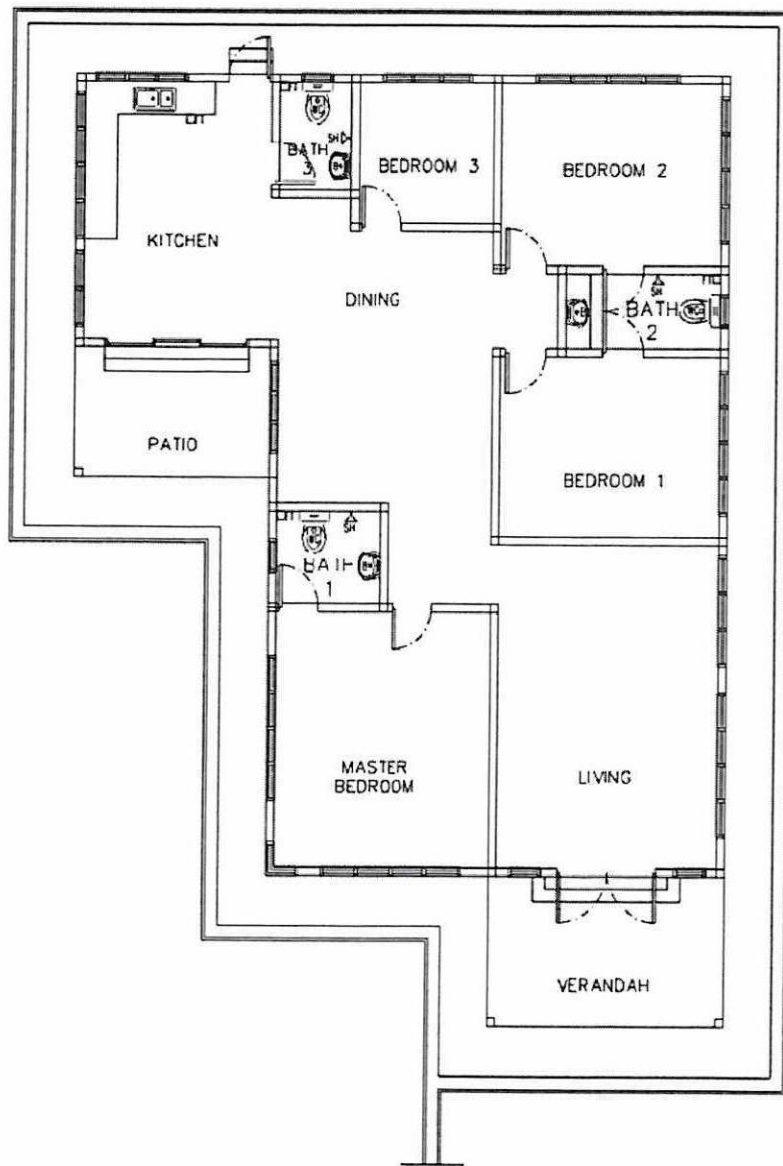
Ground floor plan of a single storey house. Refer Q3(d)(i).
